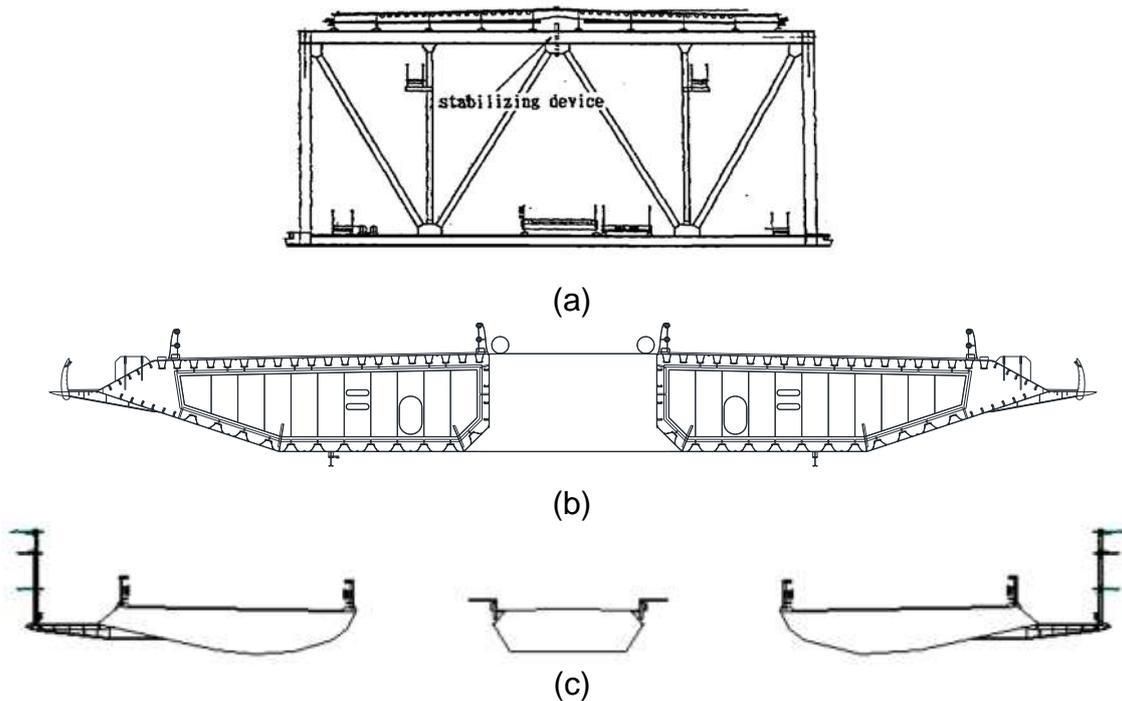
Applications of passive control facilities. (a) Central stabilizer in Akashi Kaikyo Bridge. (b) Central slotting in Xihoumen Bridge. (c) Multi-slotting in Messina Strait Bridge.
